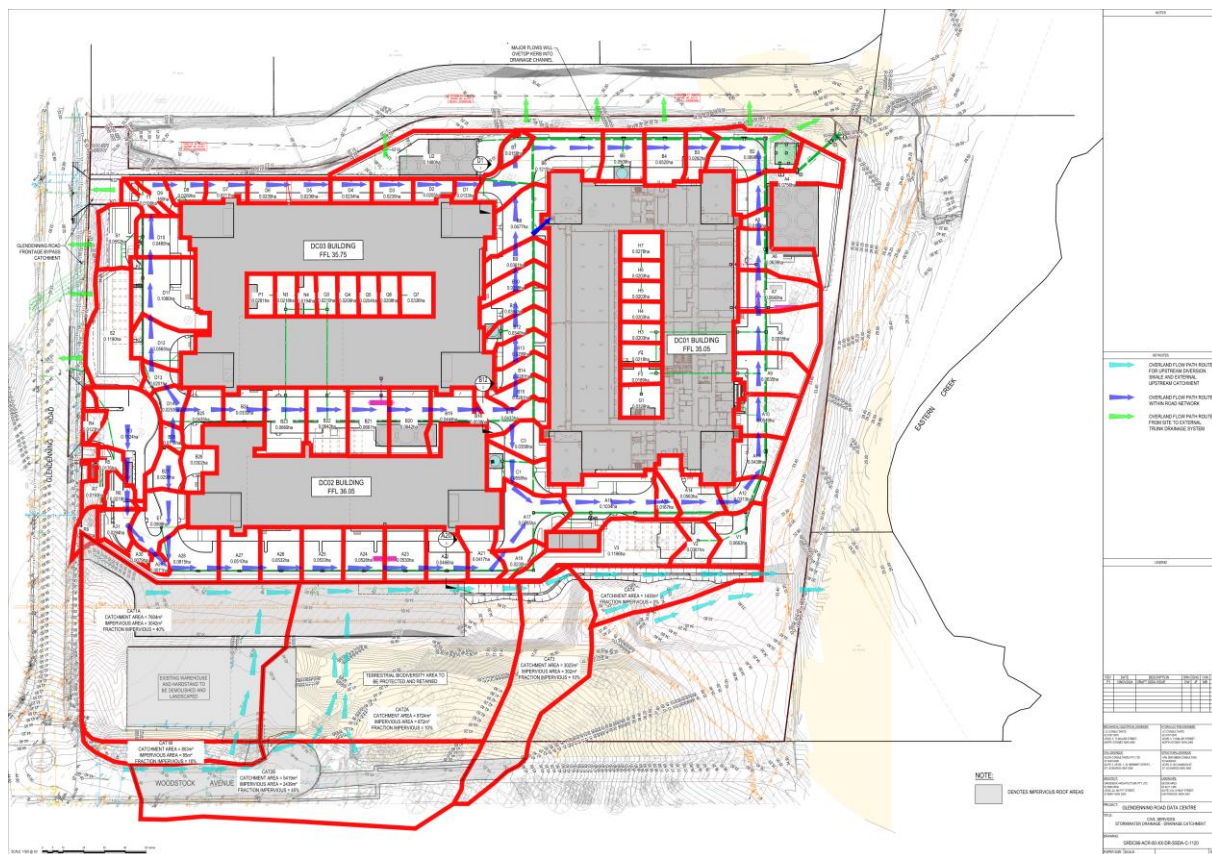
Drainage Catchment Plan with Overland Flow Path Routes
